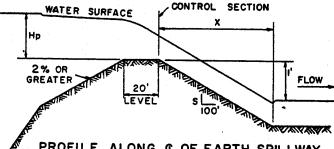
Grade Stabilization Structure: Earth Emergency Spillway (showing level section and control section)
